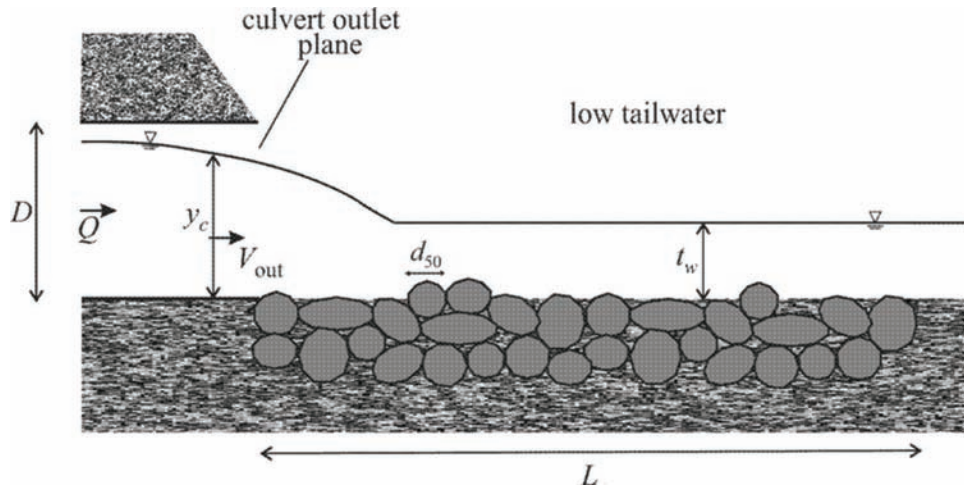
Definition sketch for culvert outlet and riprap apron.
